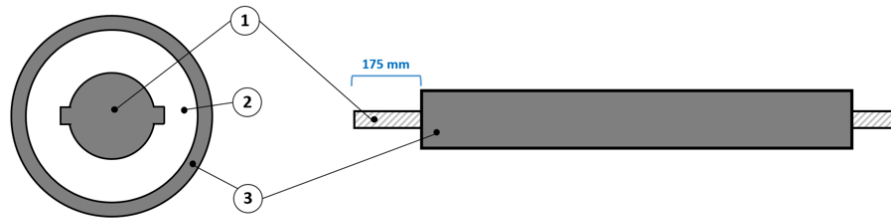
Instrumented confinement pipe and rock bolt installed prior to grouting
